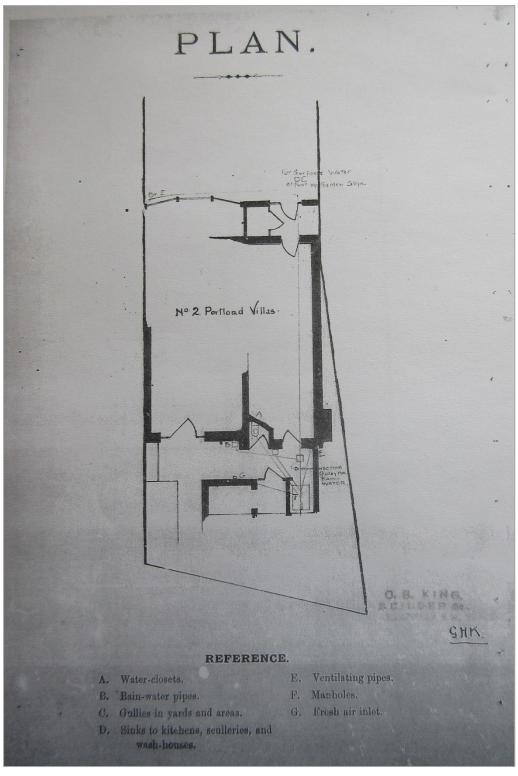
Lower ground floor plan of 2 Portland Villas, 1901 (Camden Archives)
